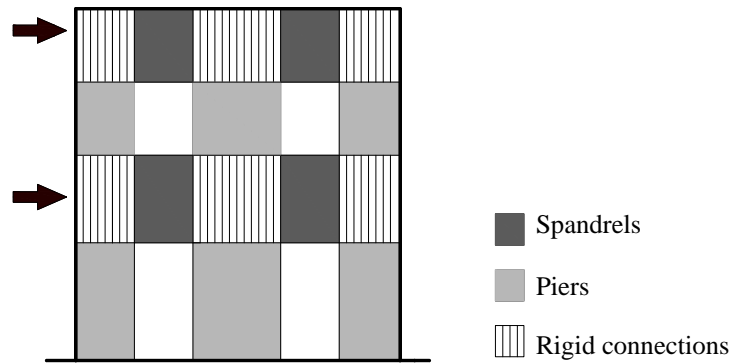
Typical in-plane masonry wall and main structural elements (adapted from Calderini et al. 2008).
